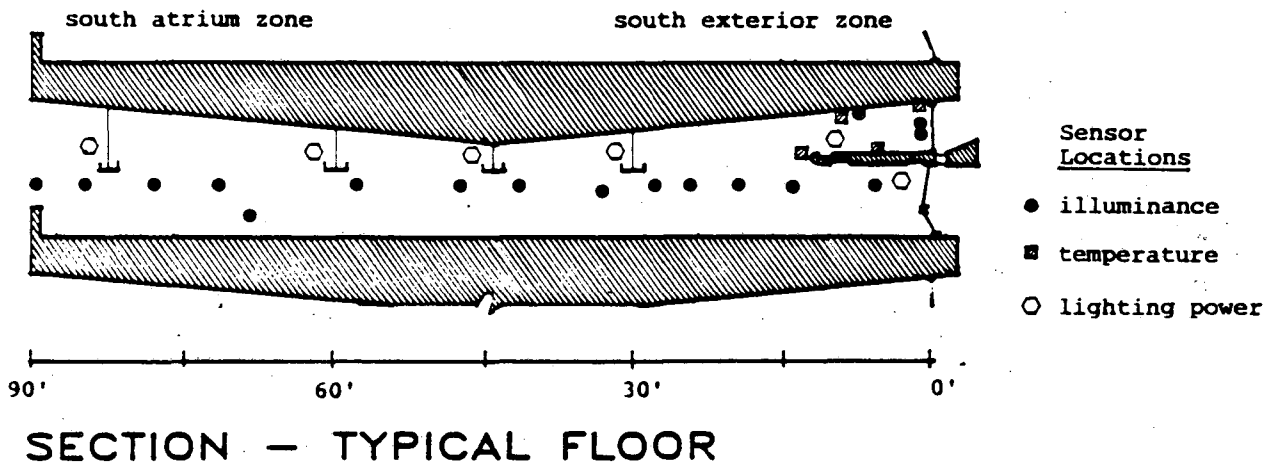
Section through the third floor on the south side of the building, showing sensor locations for data collected in this zone.
